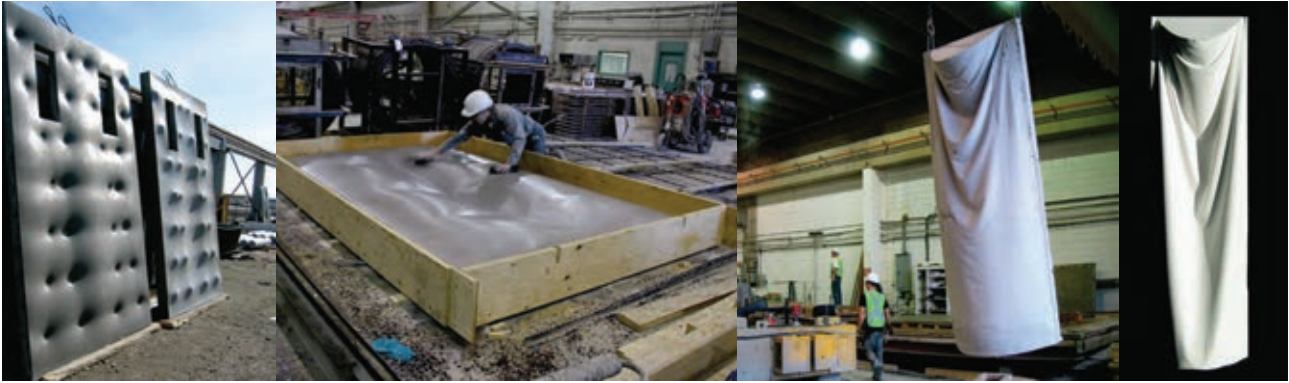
Wall panels. Steel frame (l) and vertical sheets (r) (West, 2007).
